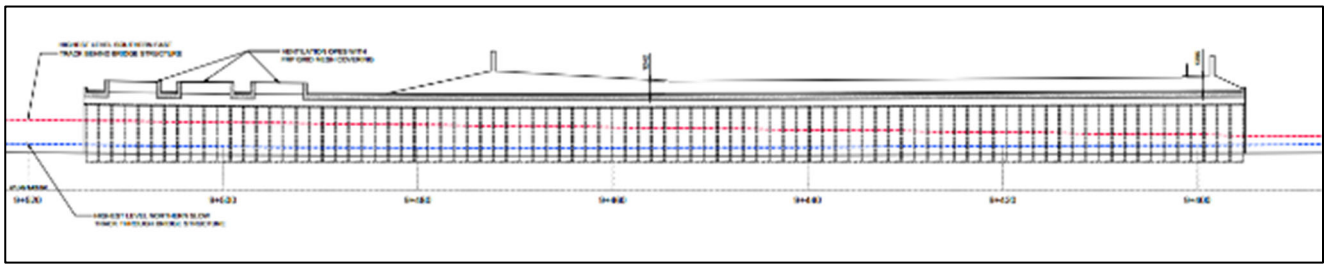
New South Circular Road Bridge (OBC1A) Longitudinal Section
